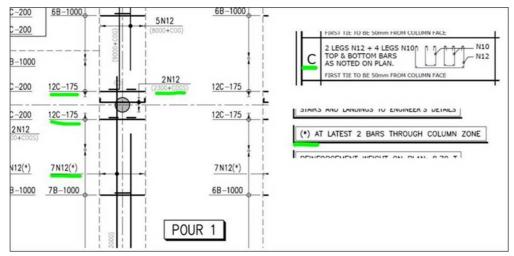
Example of nominal reinforcement to a slab band of a post-tensioned slab (*from SRIA Technical Enquiry*)
